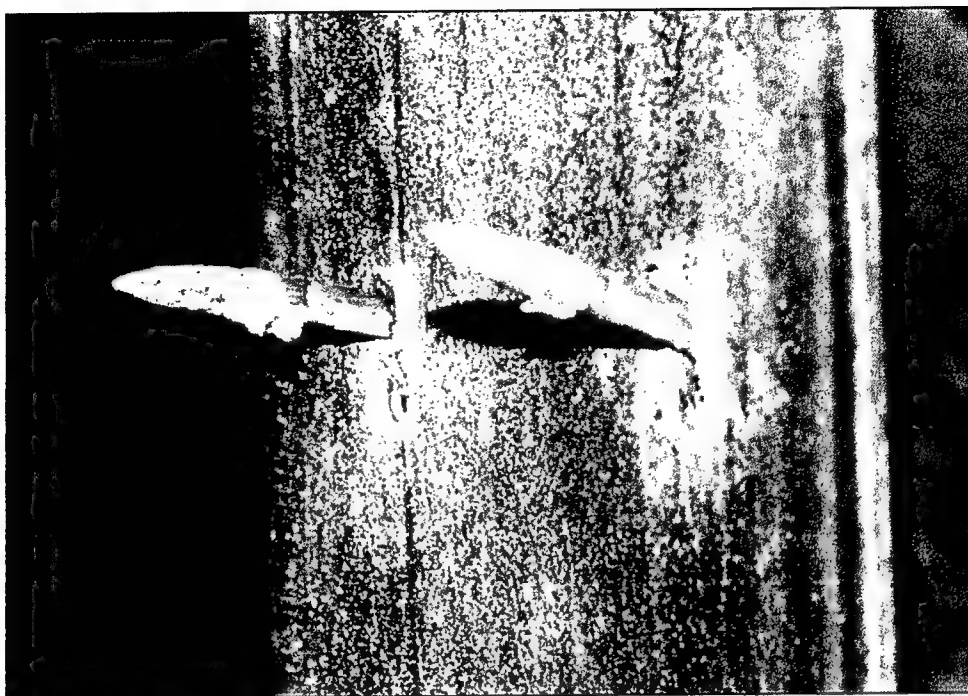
The typical keyhole slot bearing failures around the fasteners in the strip from beam H1.0-4-Y-AL47D-5
